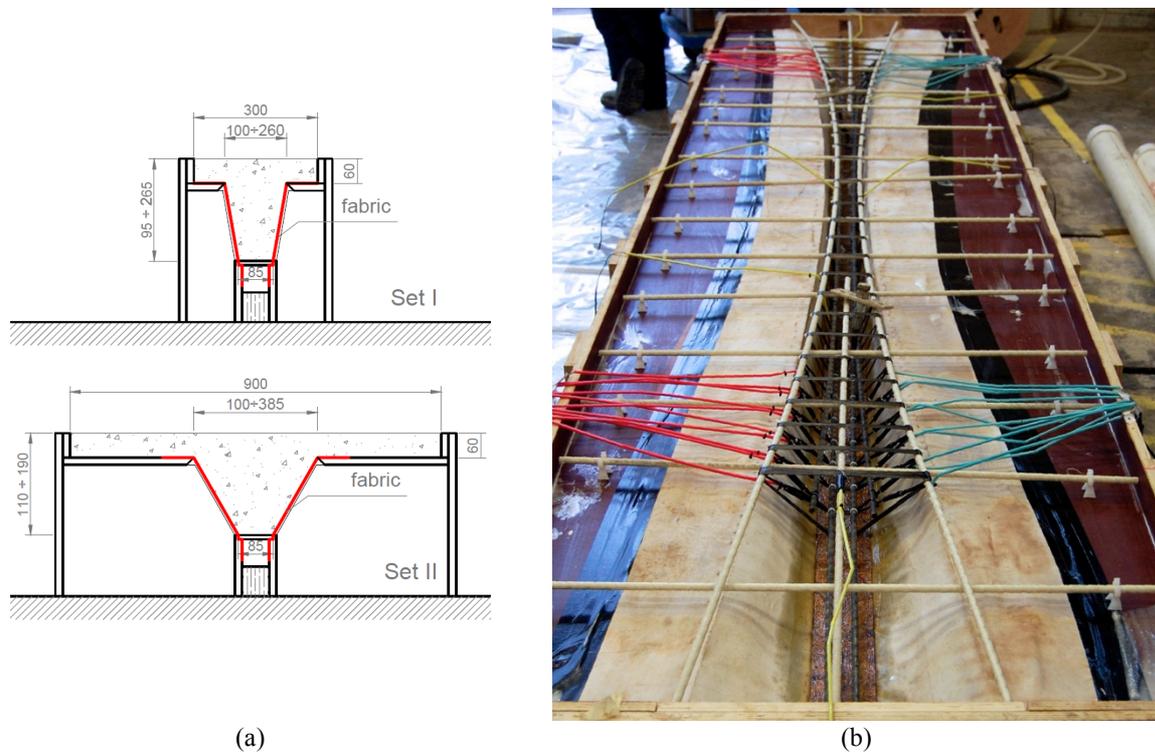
a) formworks cross-section diagram; b) instrumented W-FRP cages installed into the fabric formworks before concrete casting (beam II.2).
